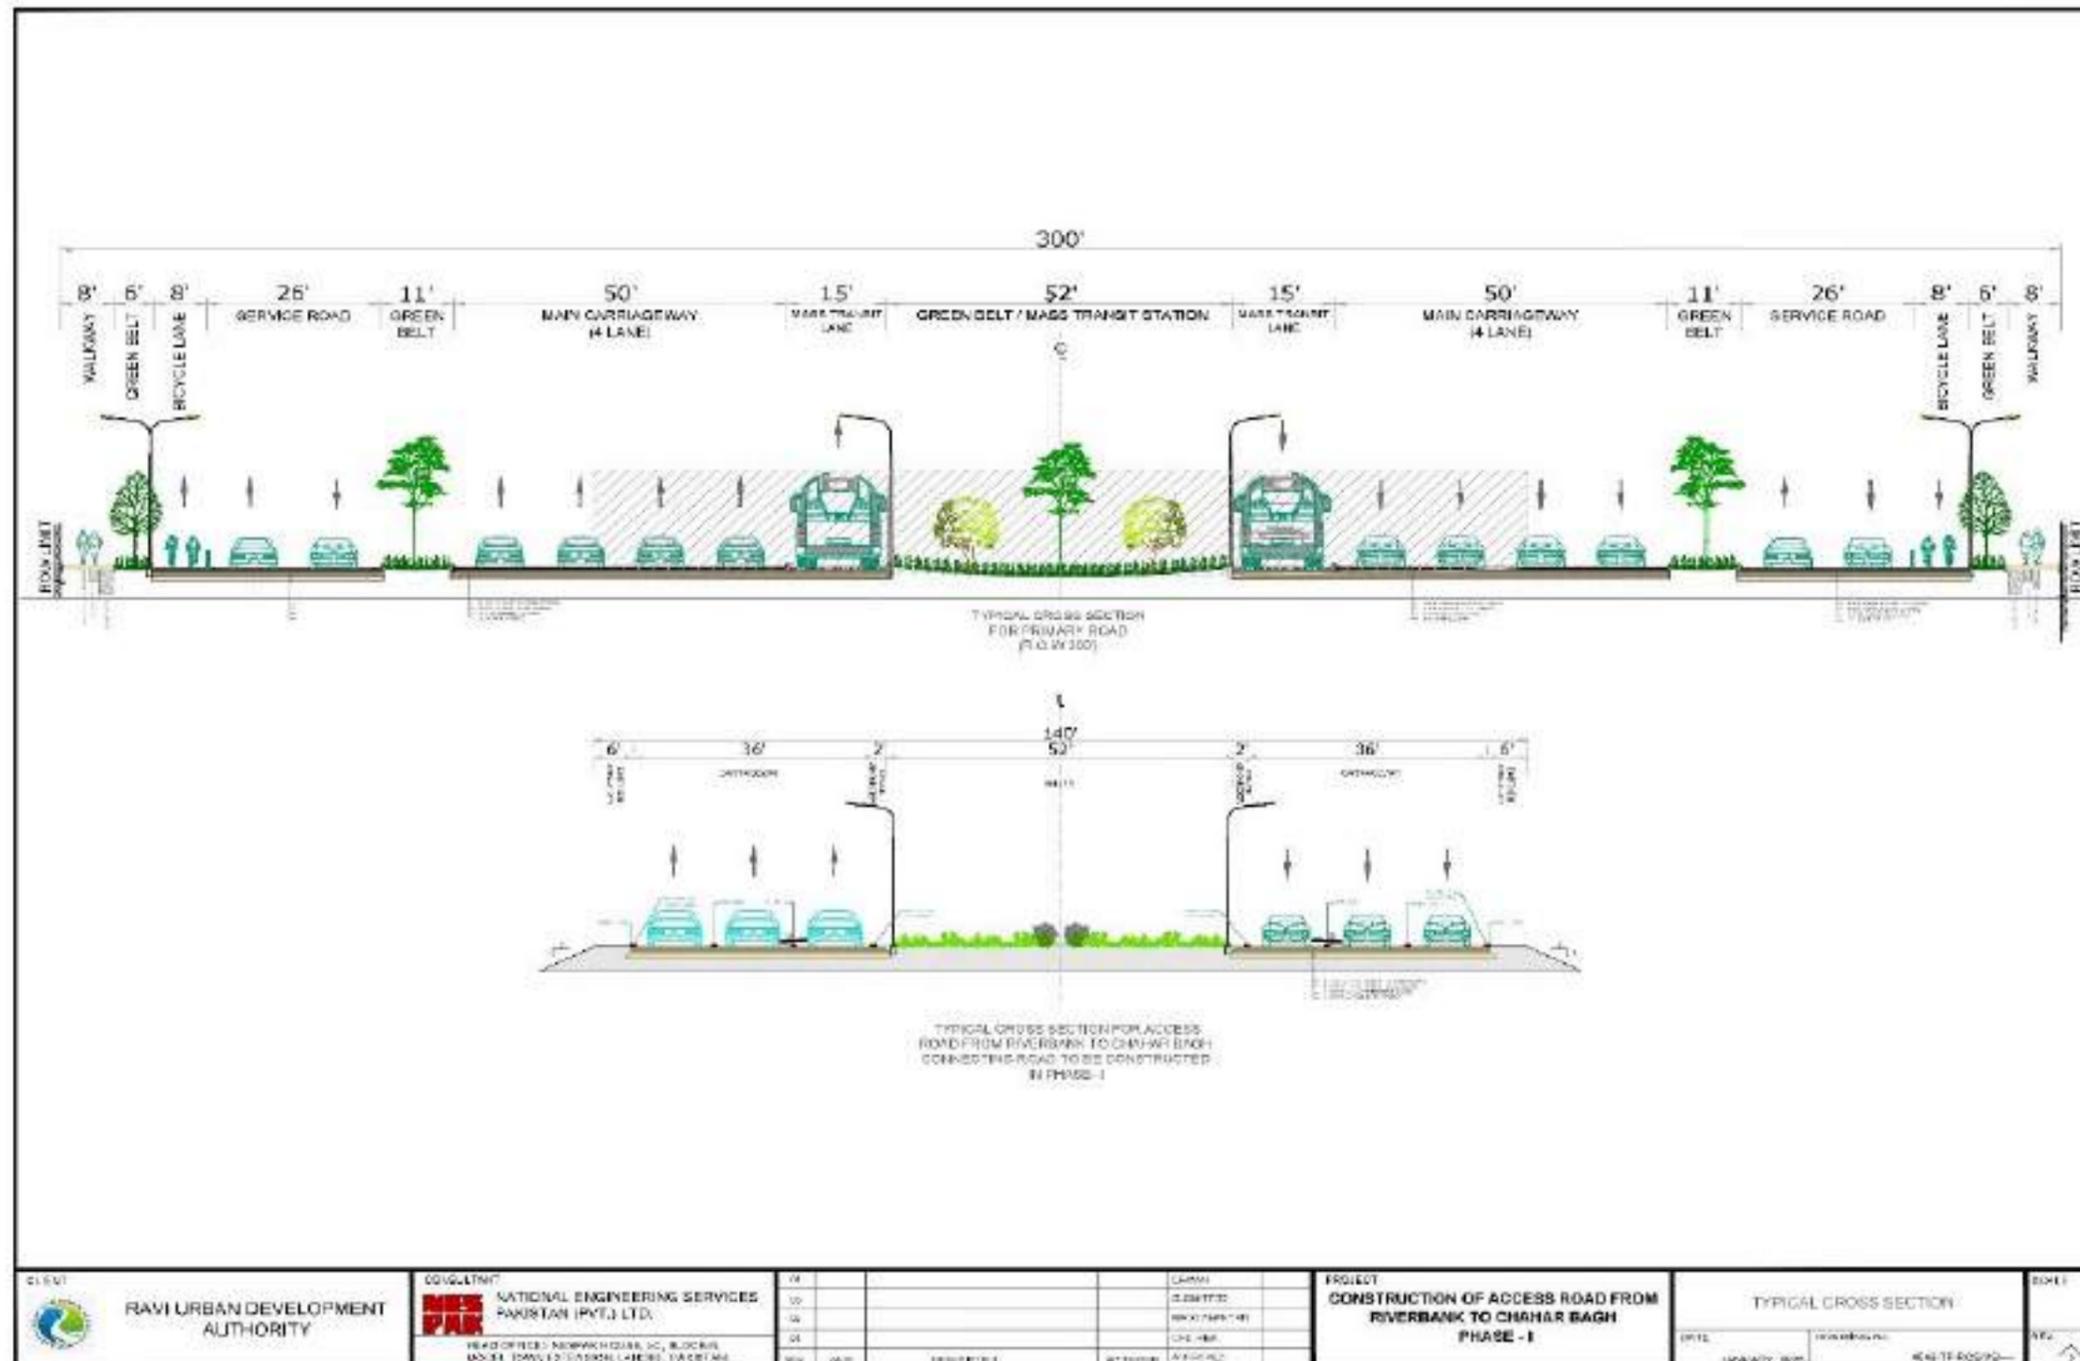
Cross section of Riverbank to Chahar bagh connecting Road
